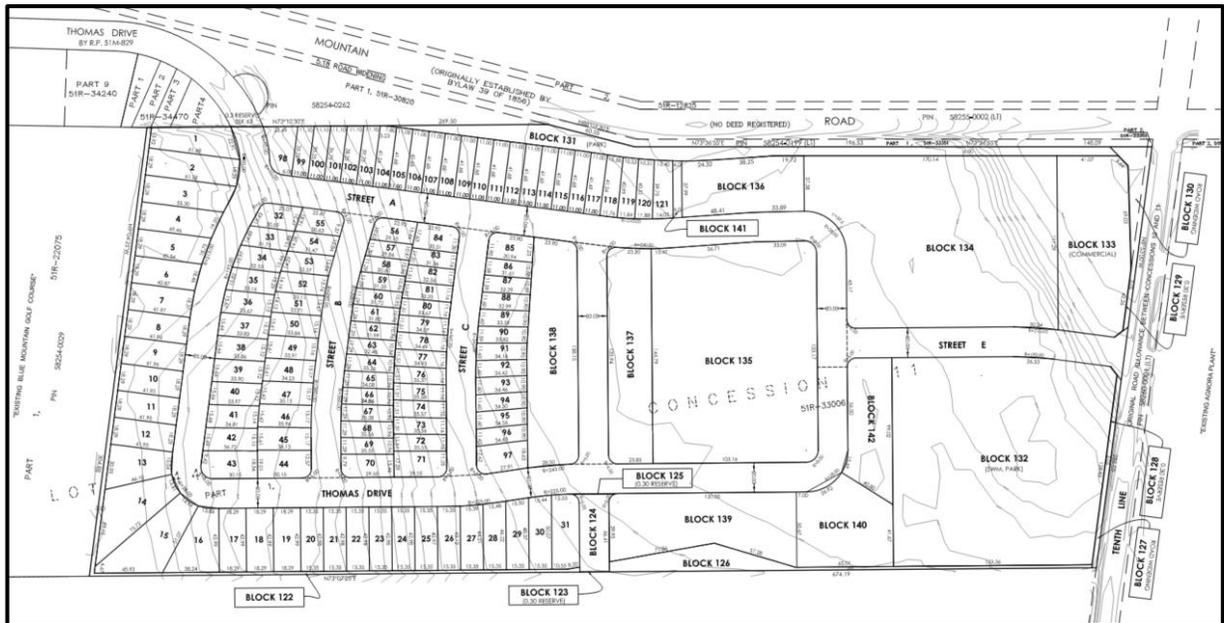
Draft Approved Plan of Subdivision (Panorama)
